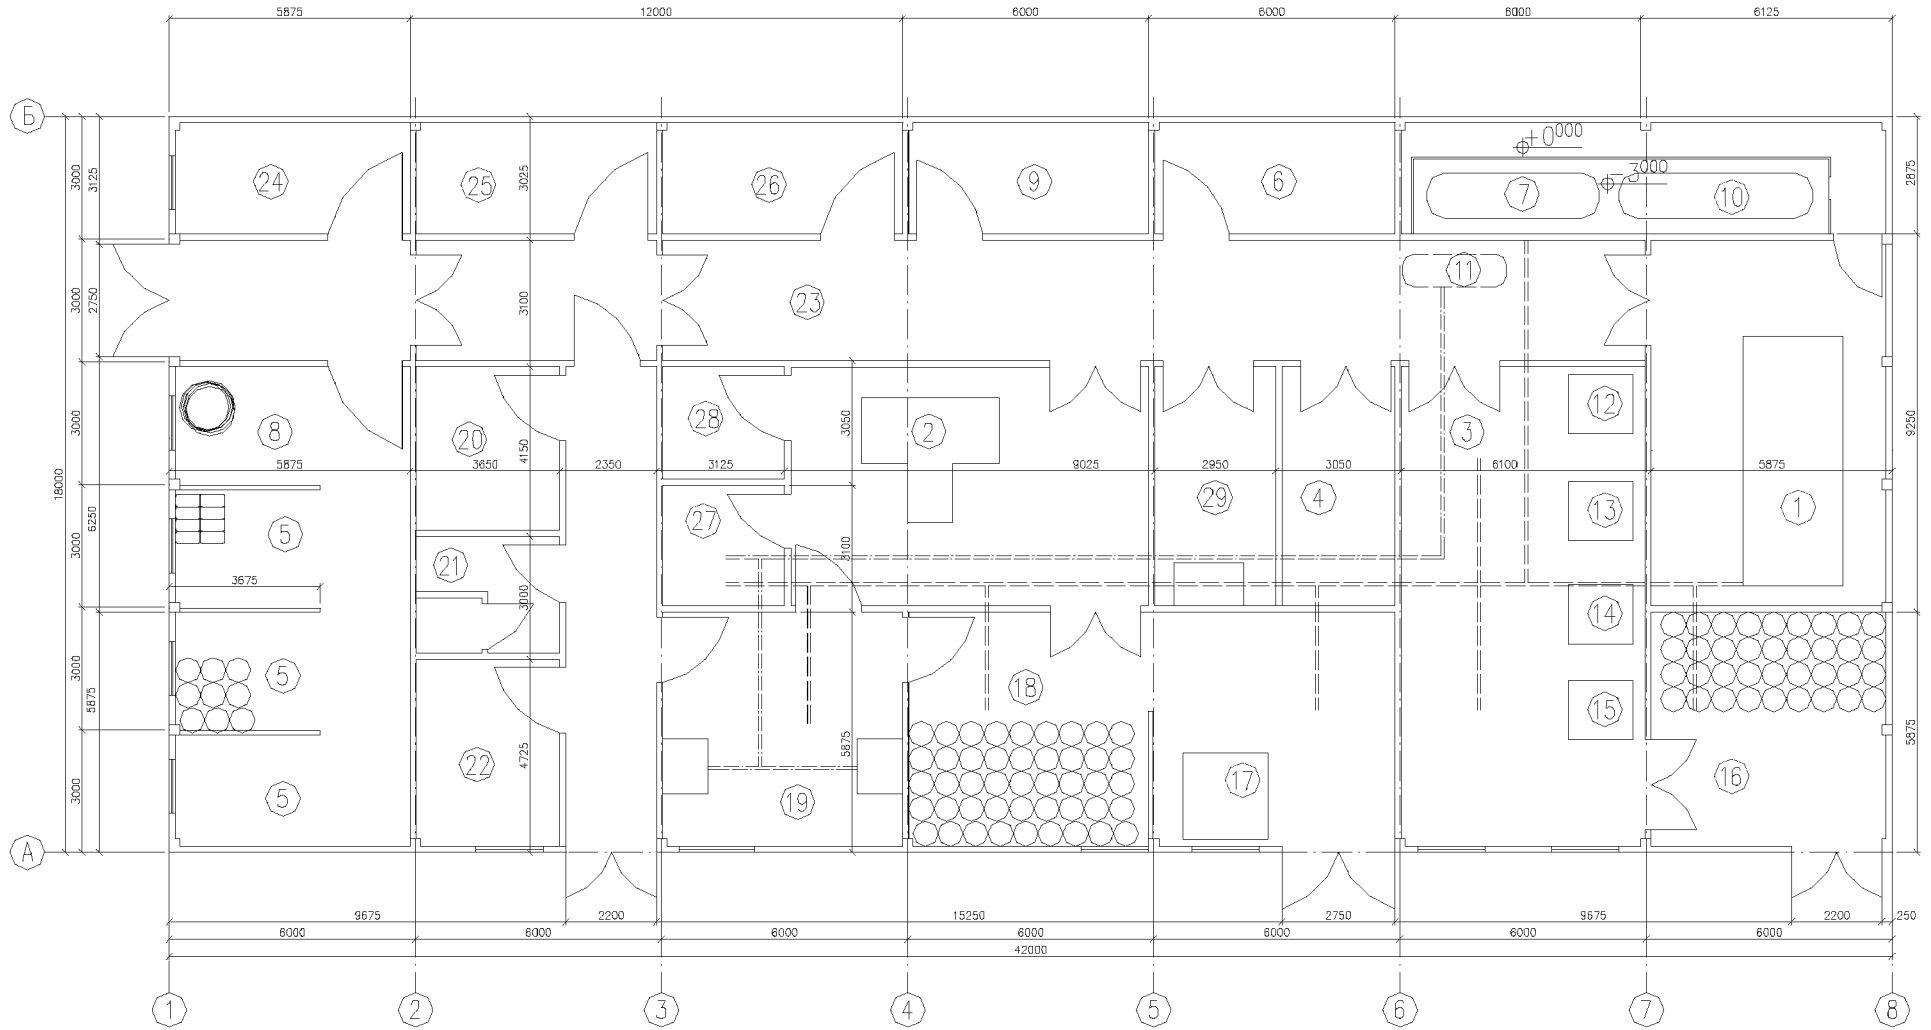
Layout of the Proposed New Low Level RW Conditioning Plant at NHRWR Site
